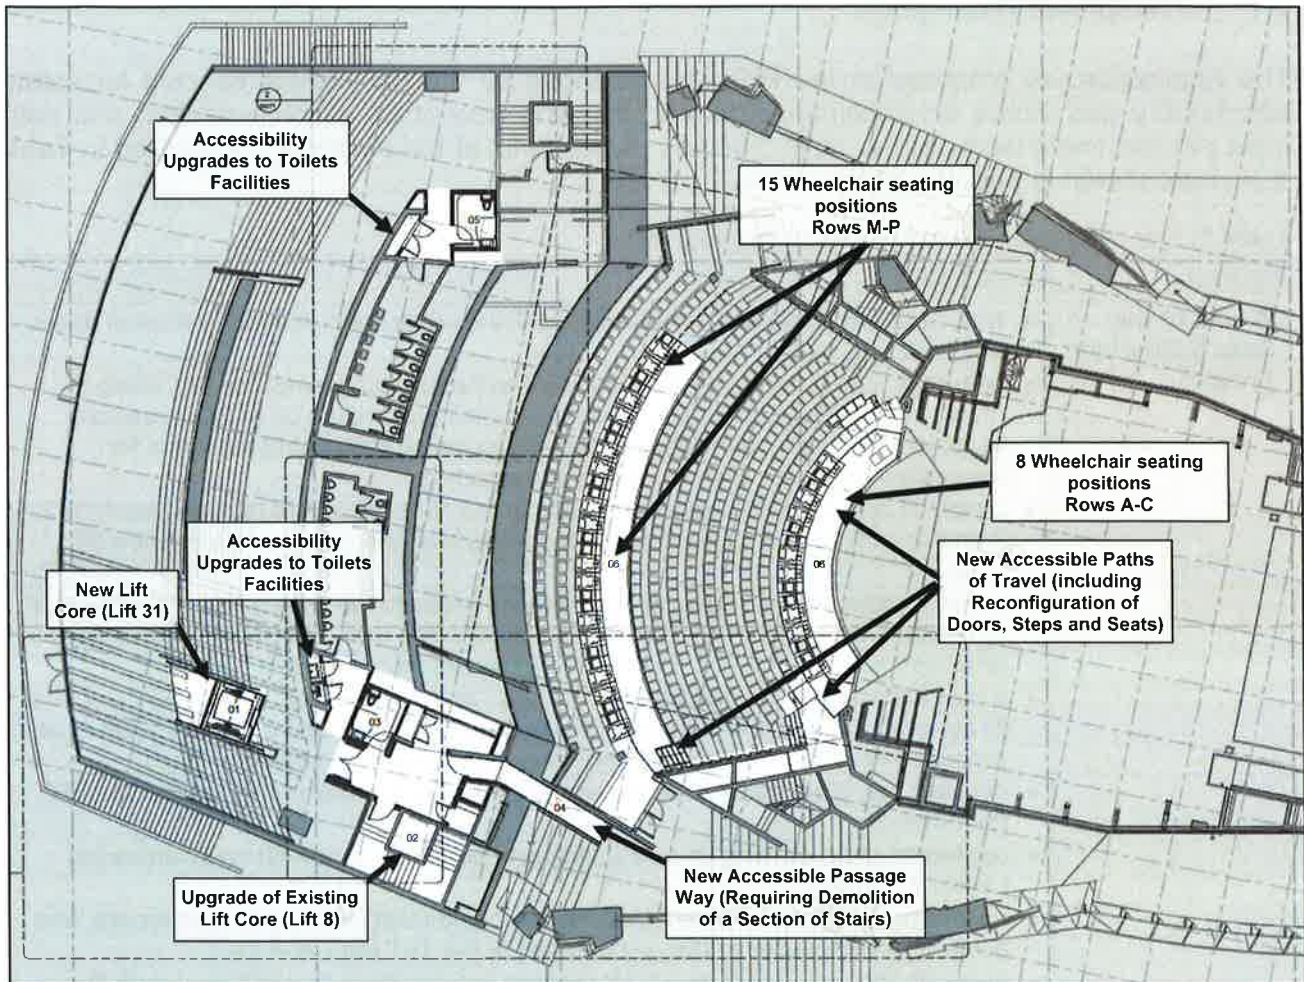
Proposed works to the JST (Level 3) (Source: EIS)
